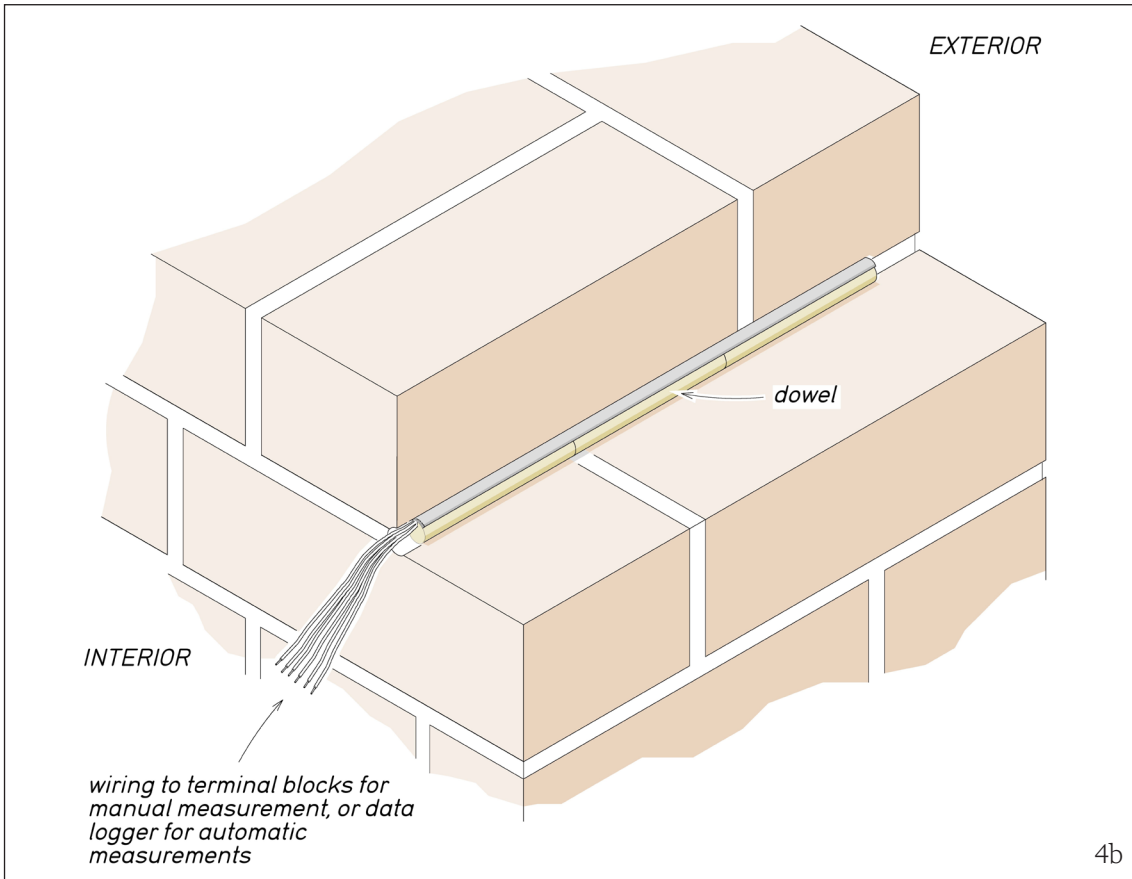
Diagram showing position of segmented timber dowel in wall.
